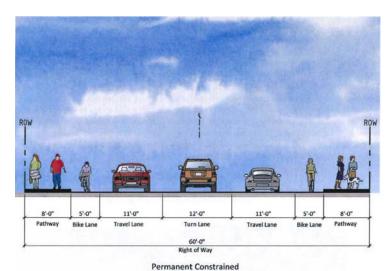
Recommended Refined Street Section, Downtown Gualala Source: Downtown Gualala Refined Streetscape Design Plan (2012)
